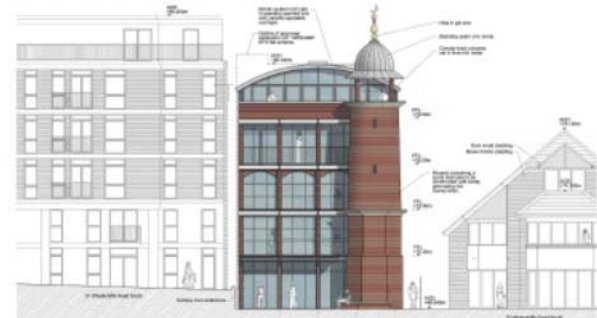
Proposed front elevation in comparison to previous planning permission (LBC Ref 14/05046/P)
